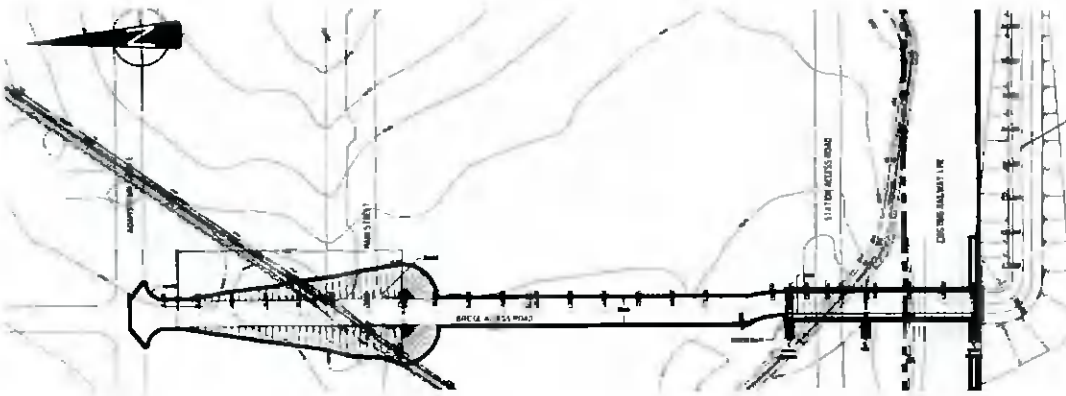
Plan view of bridge ramp - SDZ06A/6
